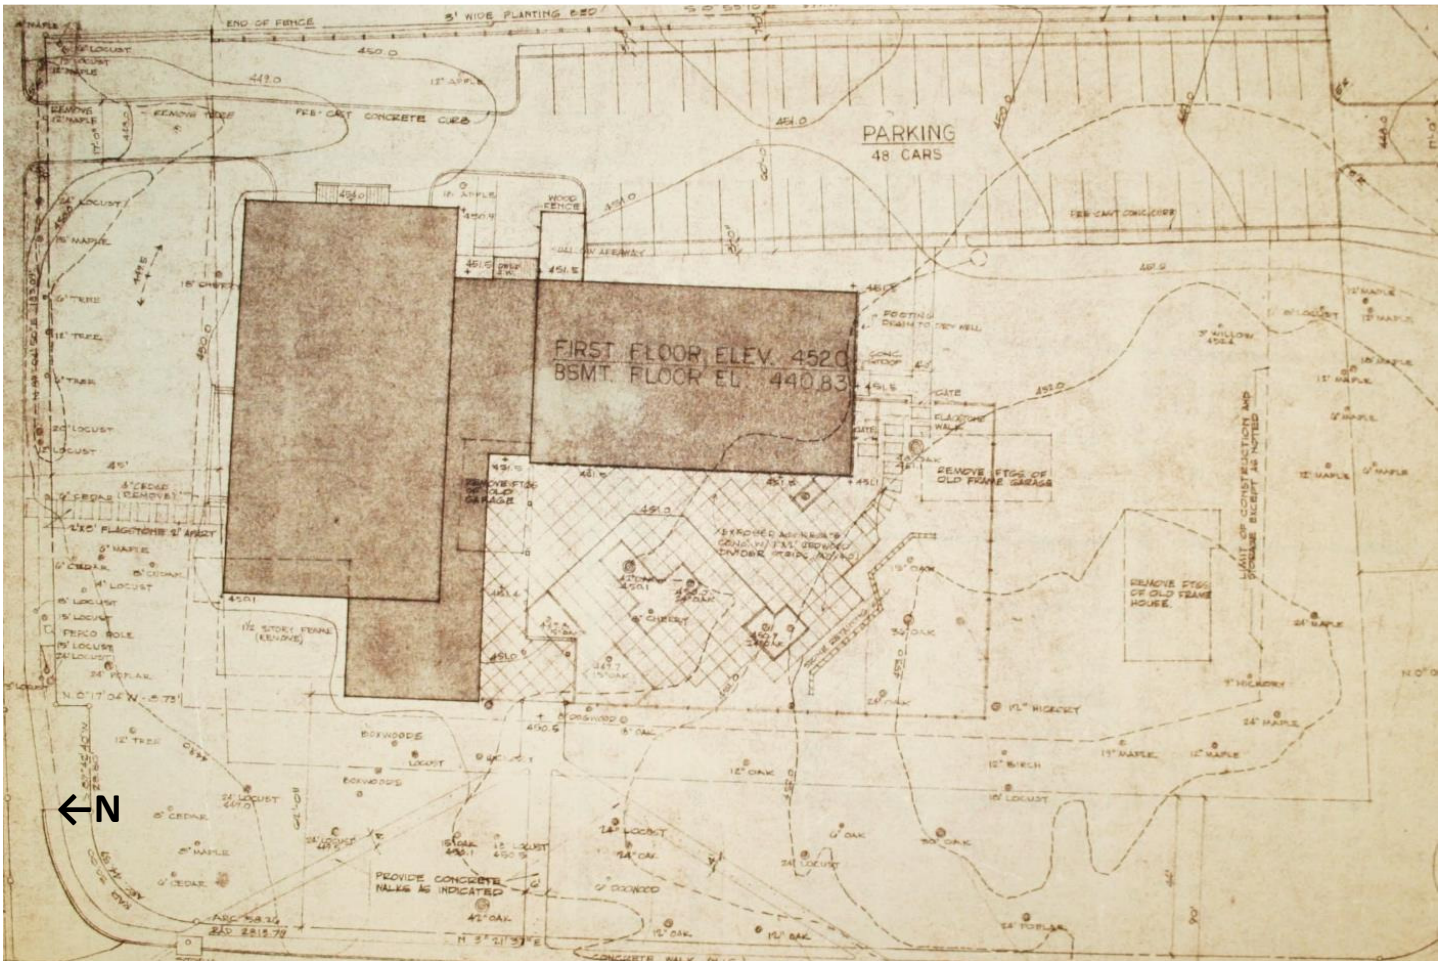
Keyes Lethbridge & Condon site plan shows existing trees to be retained.(Sheet A-1, 1963).
